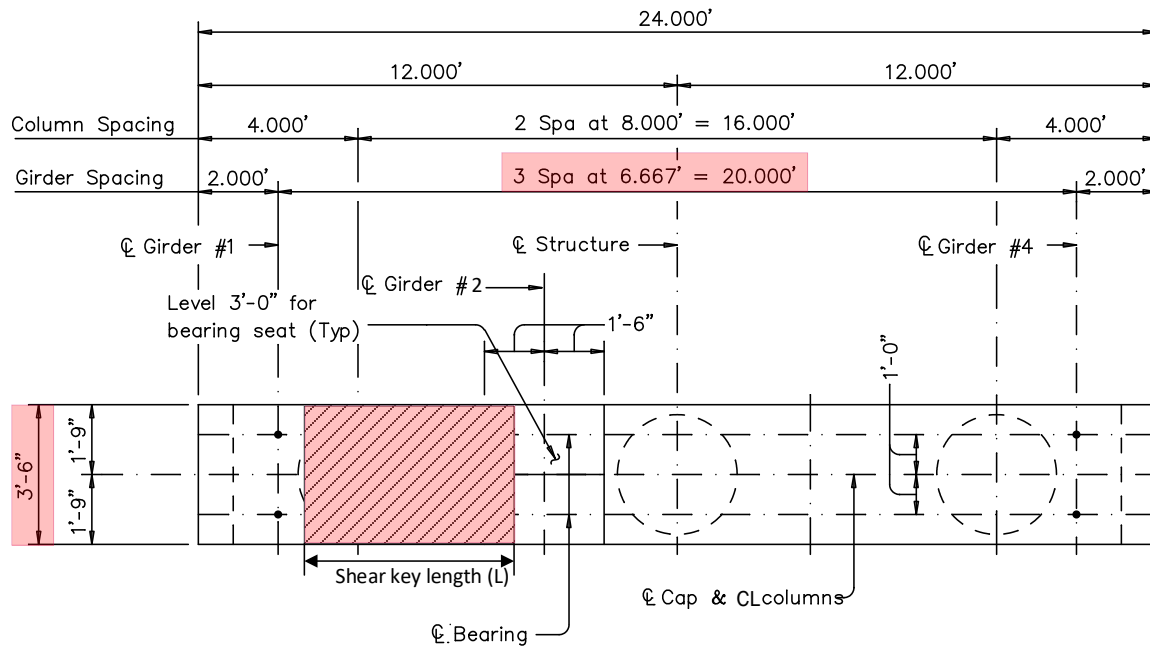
Bent cap for 24-ft roadway I-girder bridge
